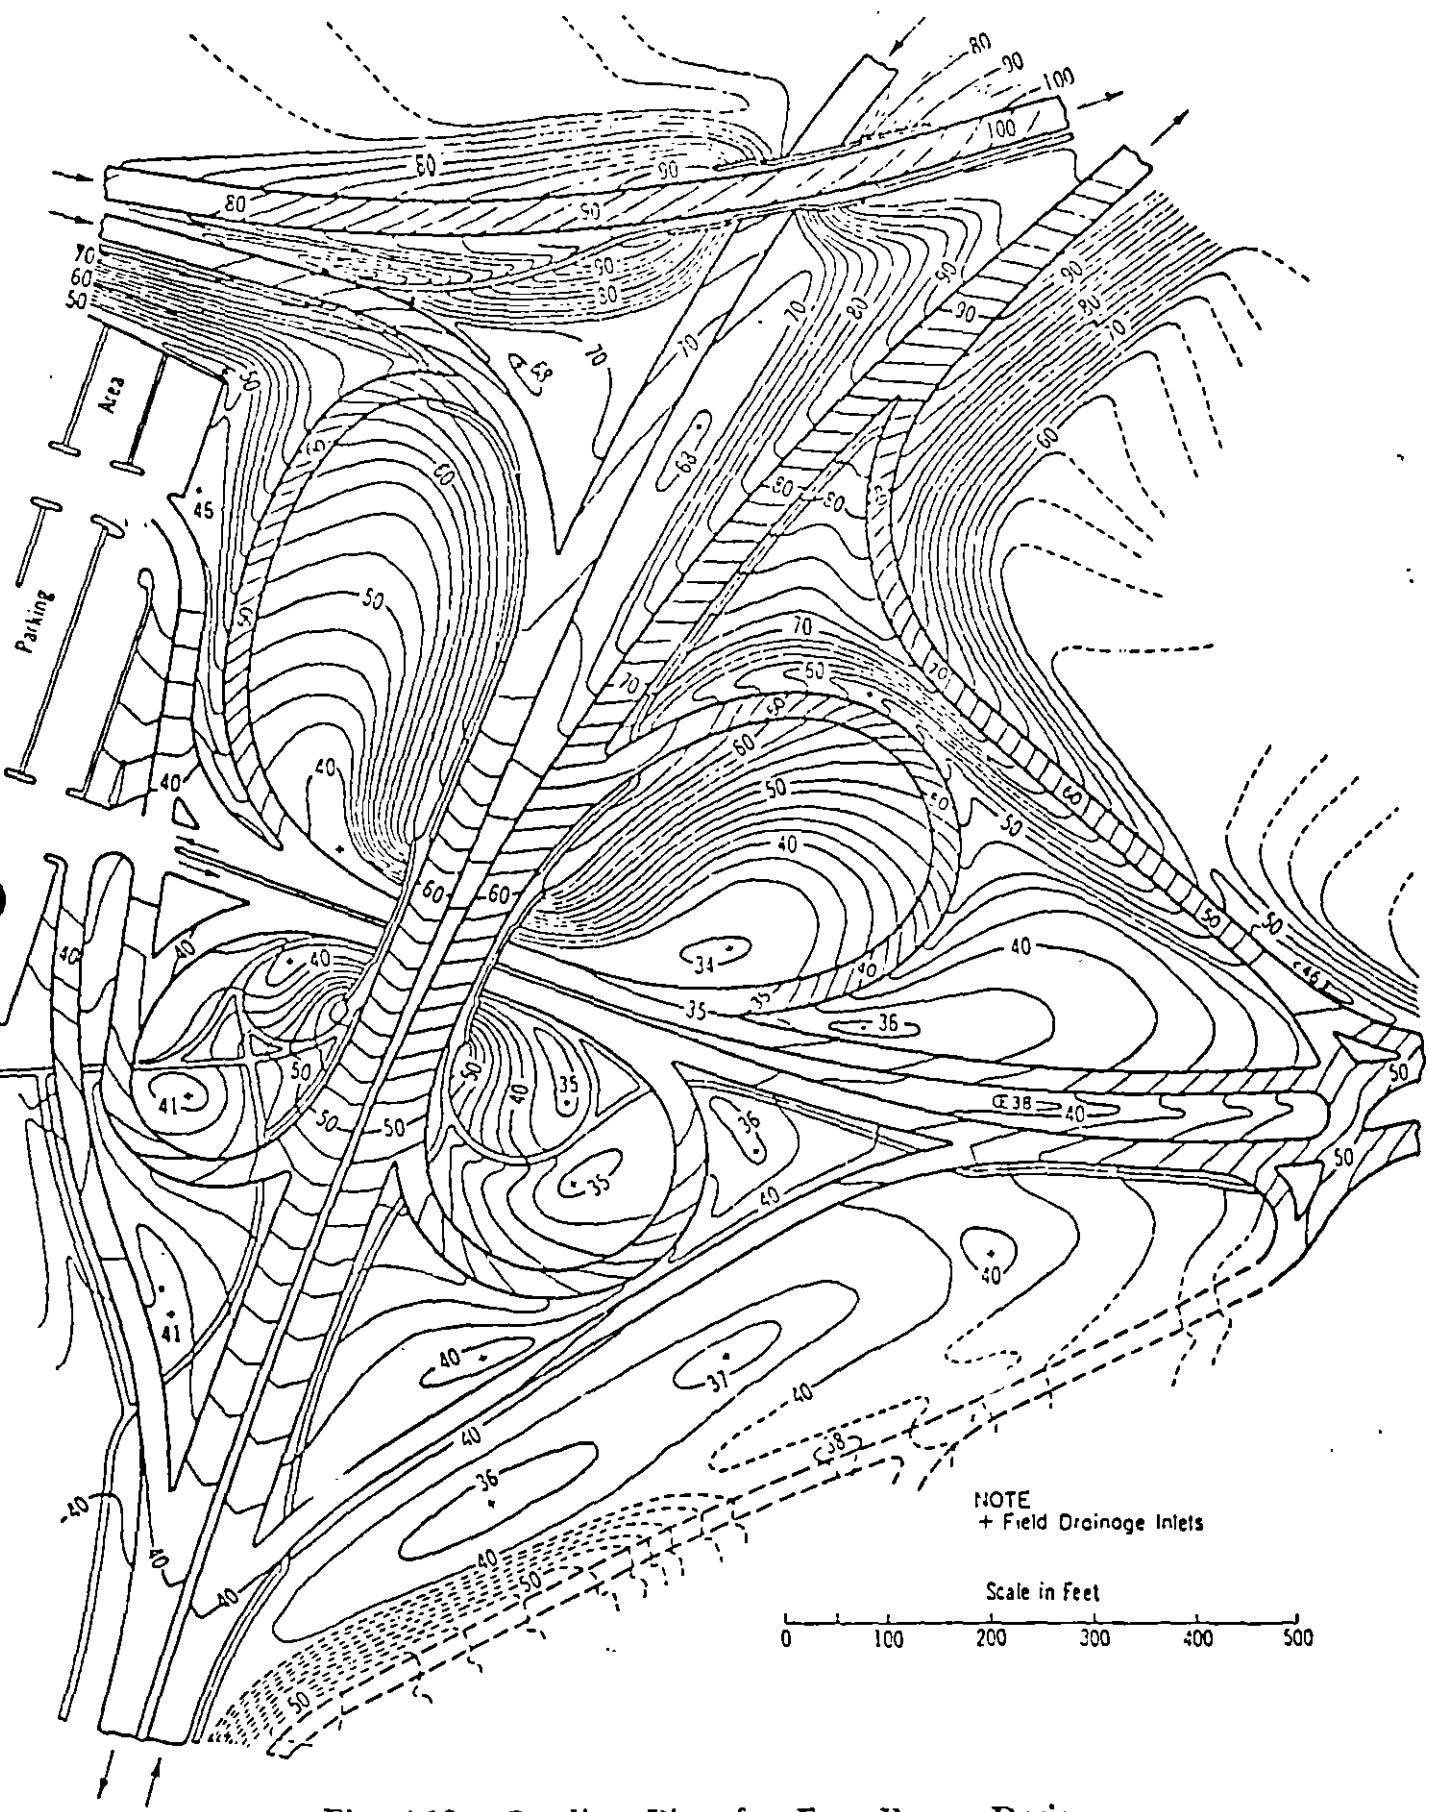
Grading Plan for Four-Ramp Design.
